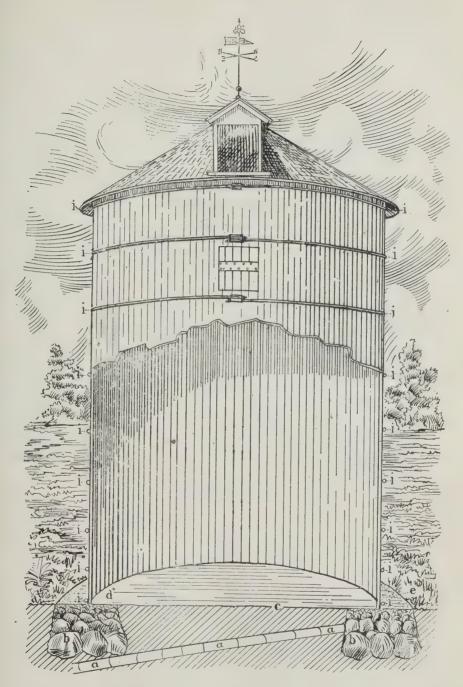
Longitudinal section of Stave Silo, showing: a a a, drain; b, foundation; c, ground floor; d, cement floor inside; e, cement floor outside; i i, etc., hoops.
